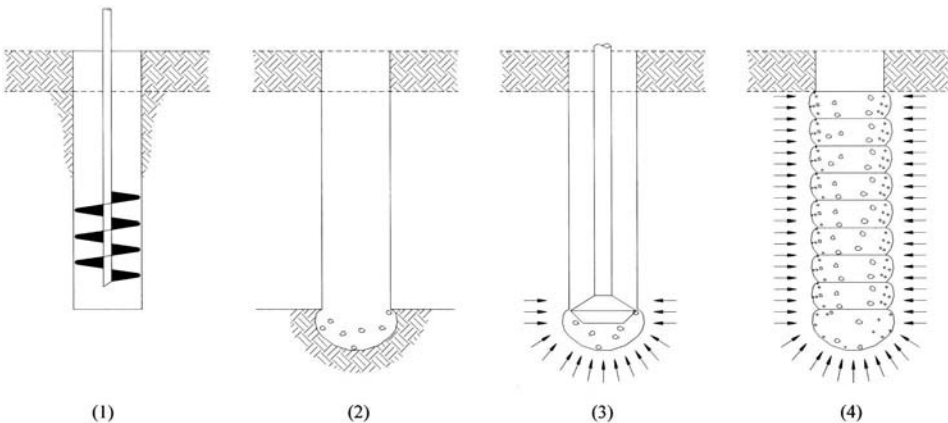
Rammed aggregate pier soil reinforcement construction process
